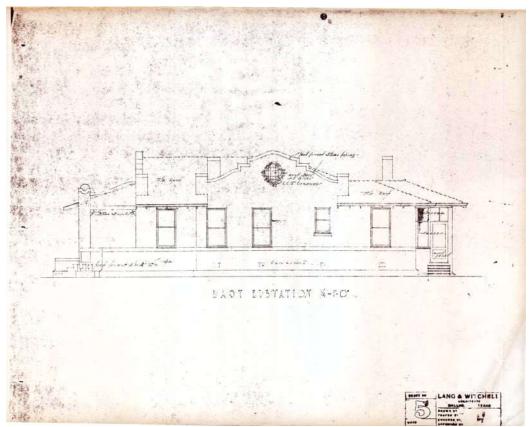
Original Lang and Witchell Side (Northeast) Elevation – Sheet 5
